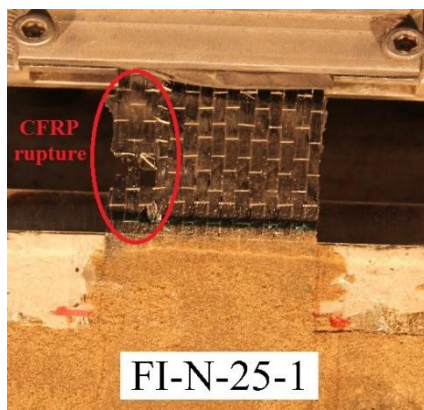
Failure mode of fiber implanted specimen at 25 °C: CFRP rupture
